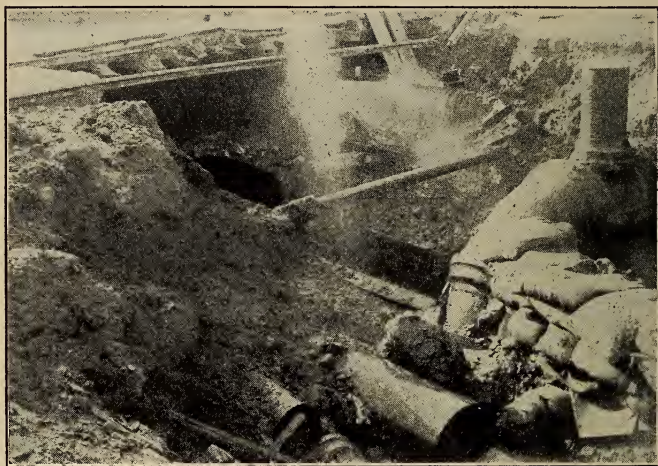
Scene Corner of Howard and Seventeenth Streets Showing Rupture of Car Tracks, Sewer, Water and Gas Pipes.
